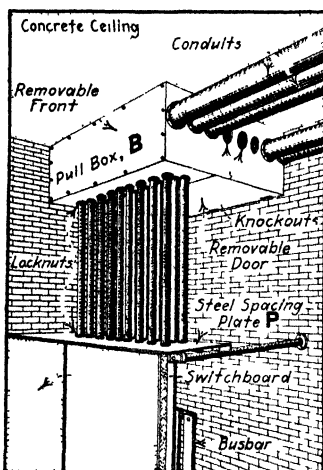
Pull box, B, and steel spacing plate, P, mounted over switchboard
